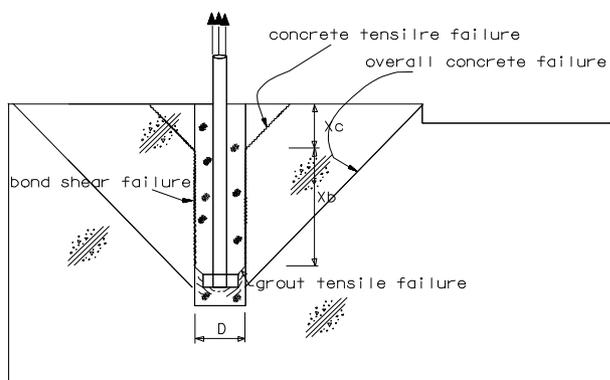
Possible failure mechanism of grouted anchor bolt
